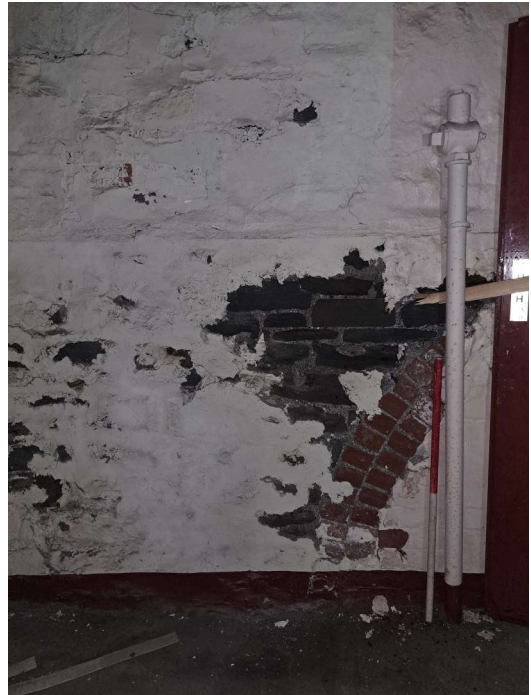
Pennant stone wall with ash lime mortar and remains of a brick head arch in the northern wall of Building 5 (southern wall of Building 4). 1 x 1m scale
